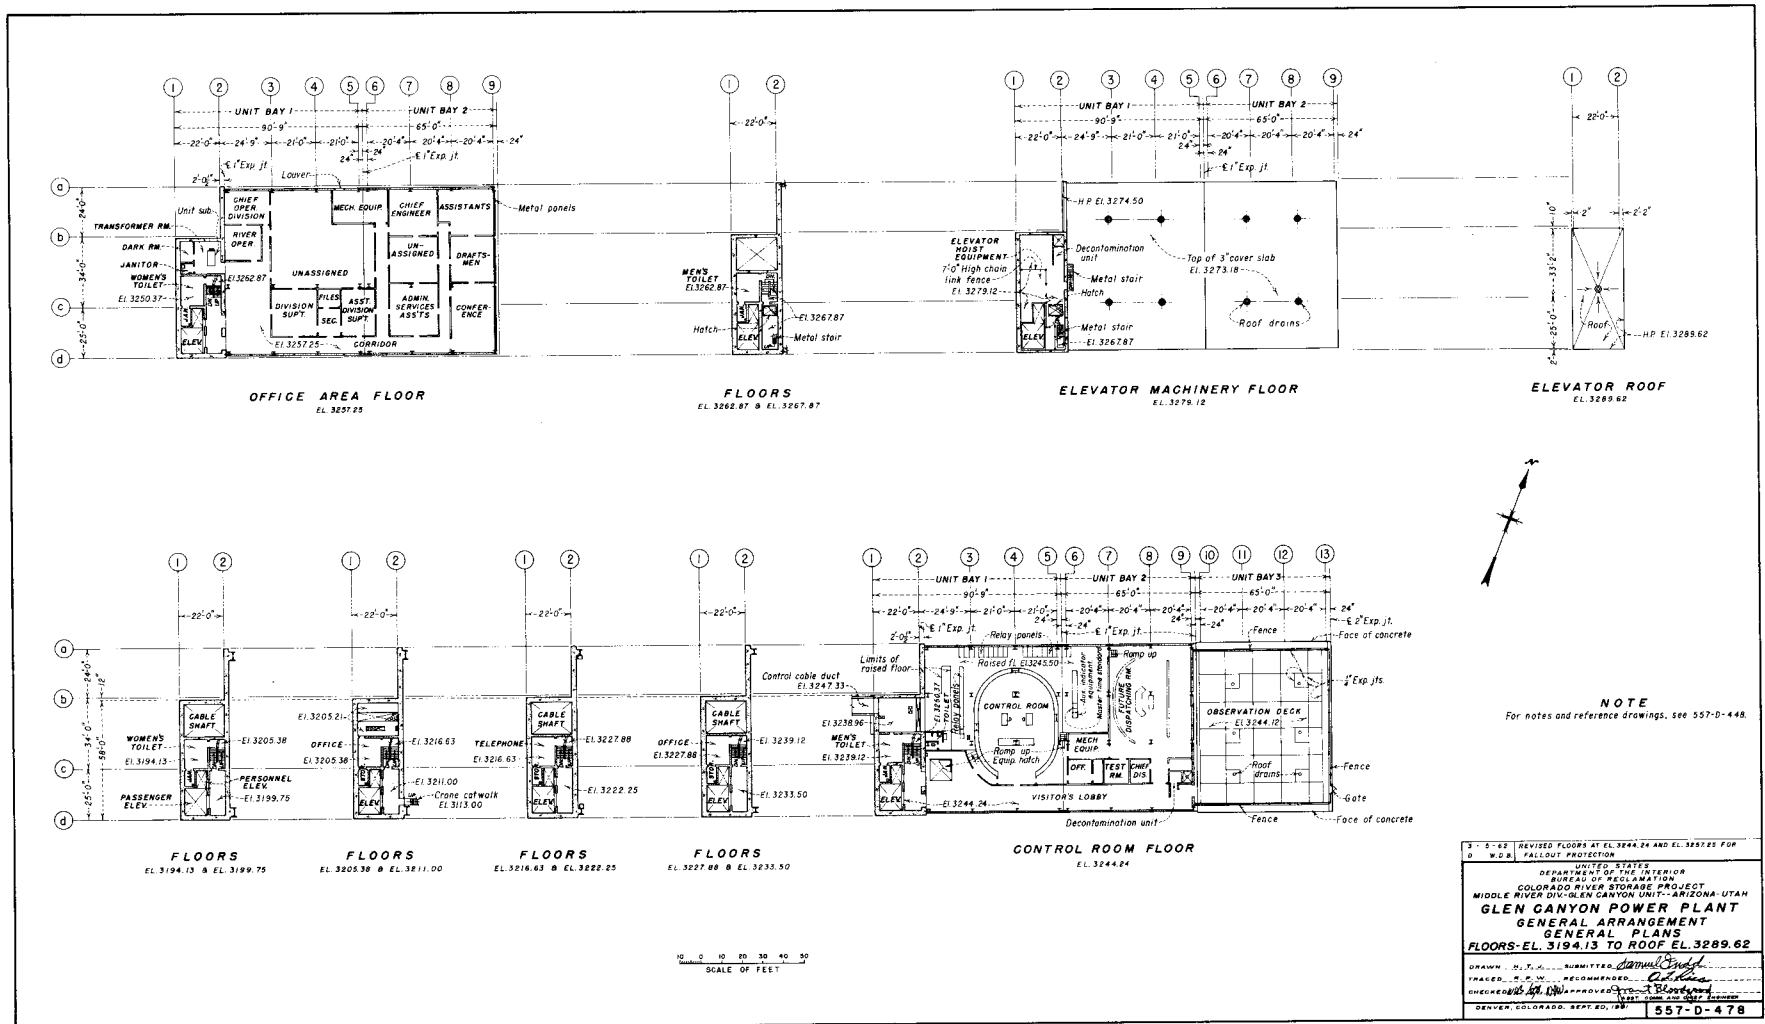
Powerplant general arrangement—Plans, floor elevation 3194.13 to roof elevation 3289.62.
